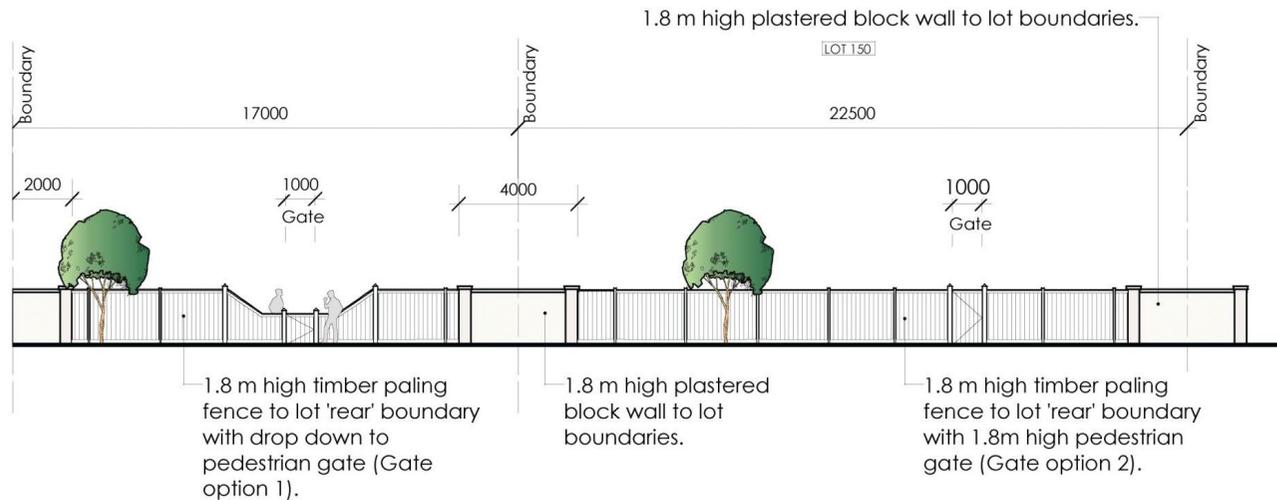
Developed (part) Elevation East Elevation Typical Fencing/Walls to Lane Boundaries (Lots 149-150)
